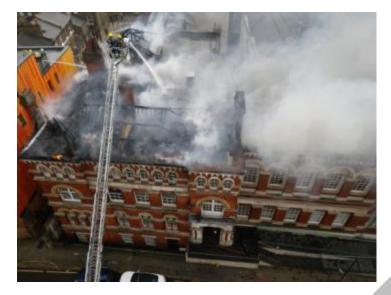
Fire in Walworth Town Hall, London, thought to have been started during building work to repair the roof – photograph courtesy of London Fire Brigade
